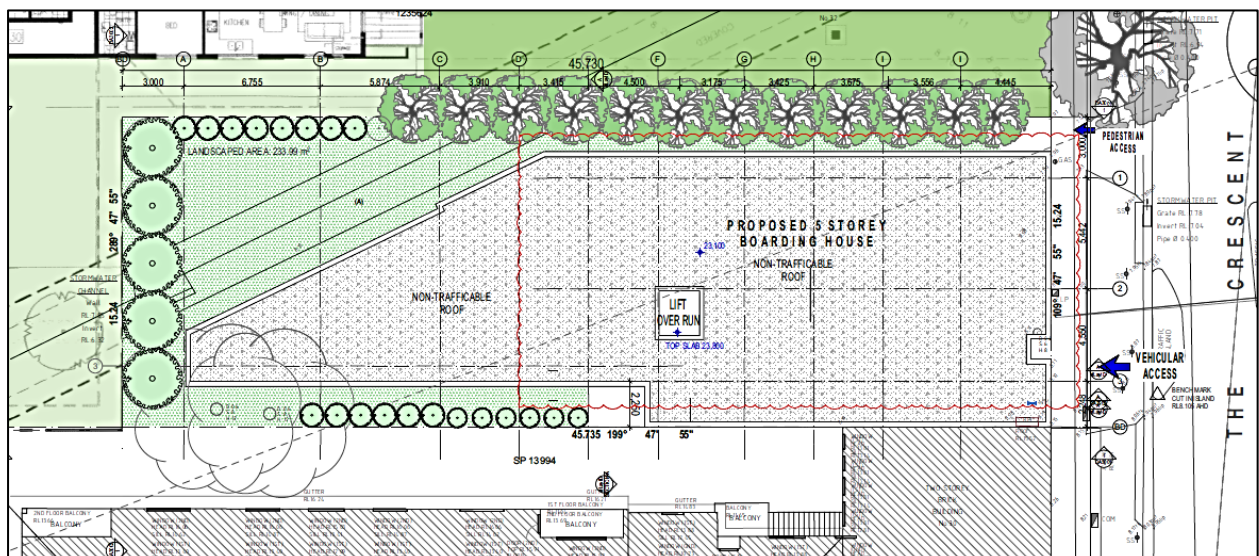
Approved Roof Plan – DA 2018/67/1 (dated 1 March 2019)
